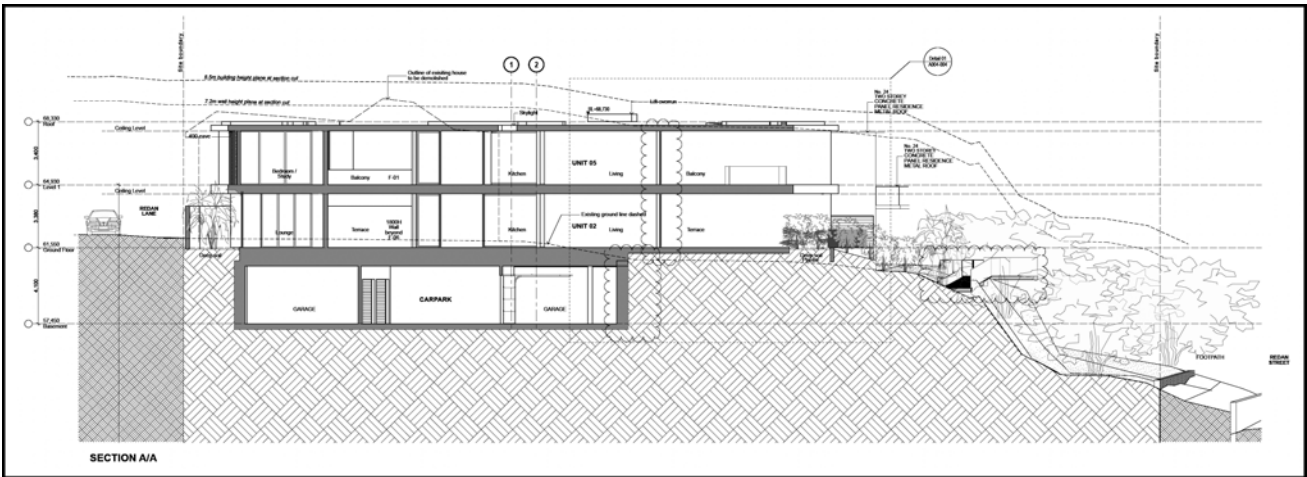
East-west section through proposed design – from Fox Johnston Architects
